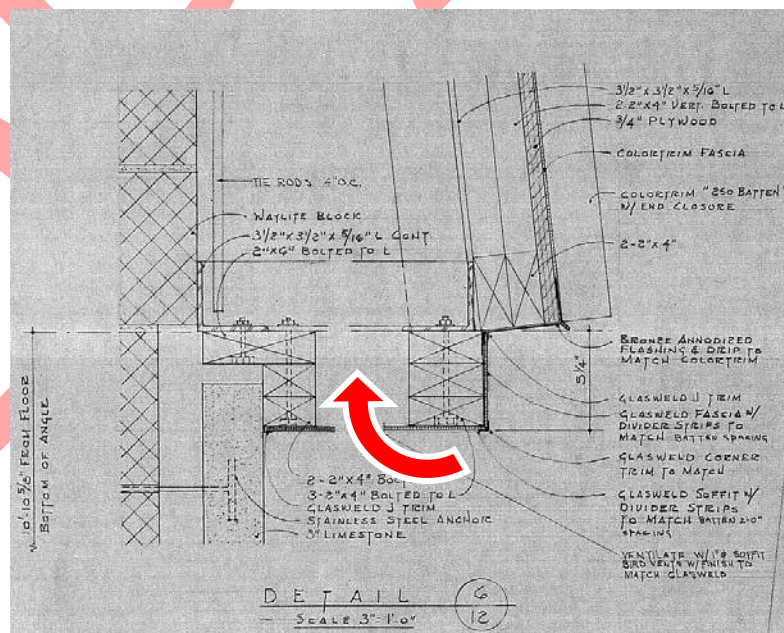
Soffit section detail. Typical construction at metal wall panel to metal fascia soffit transition. Detail taken from Detail 6/12 of the 1968 Drawings.
